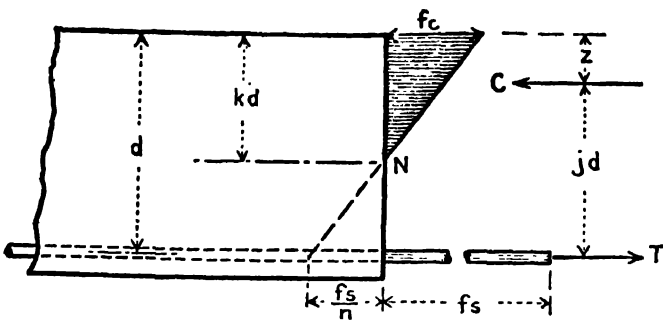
Nomenclature for concrete beam reinforced for tension.
